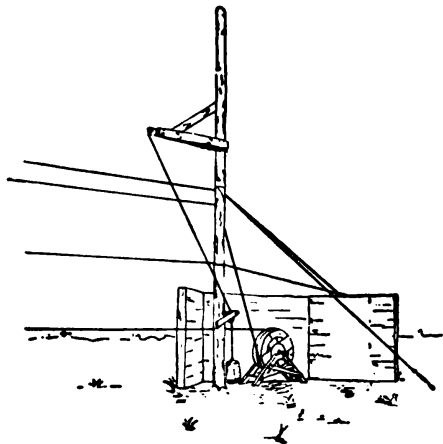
Rear view of nonoverhead range butts, showing drum, guide wires, and bumper.
